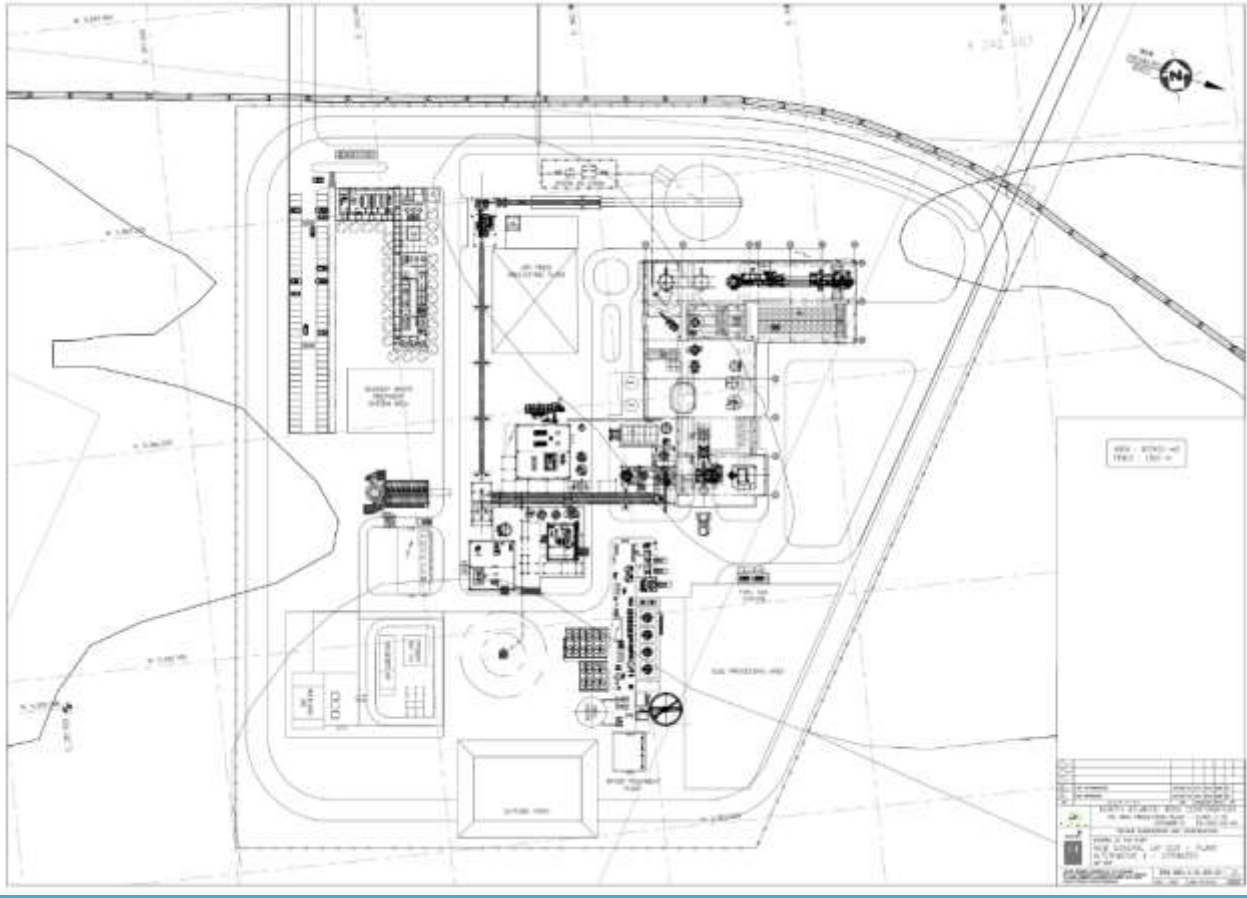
plan view of PURE FONTE LTÉE layout
